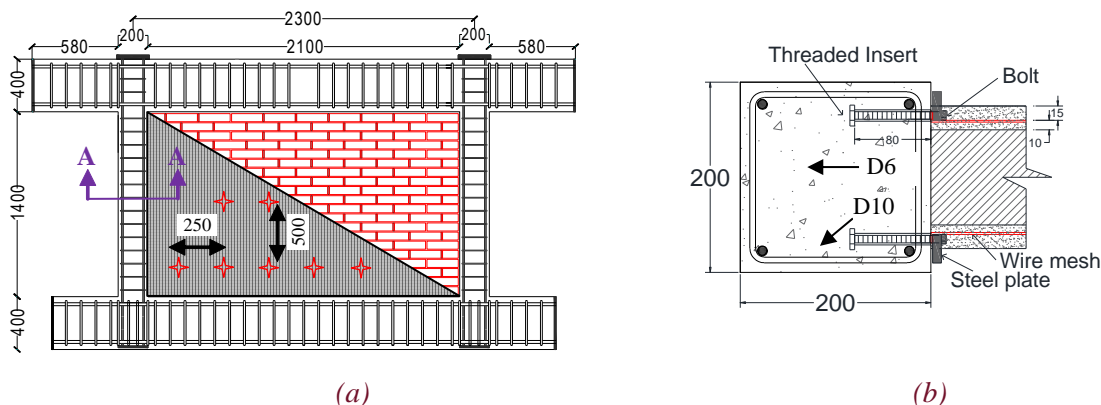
(a) Geometry of masonry infilled RC frame (b) connection of wire mesh to RC frame
